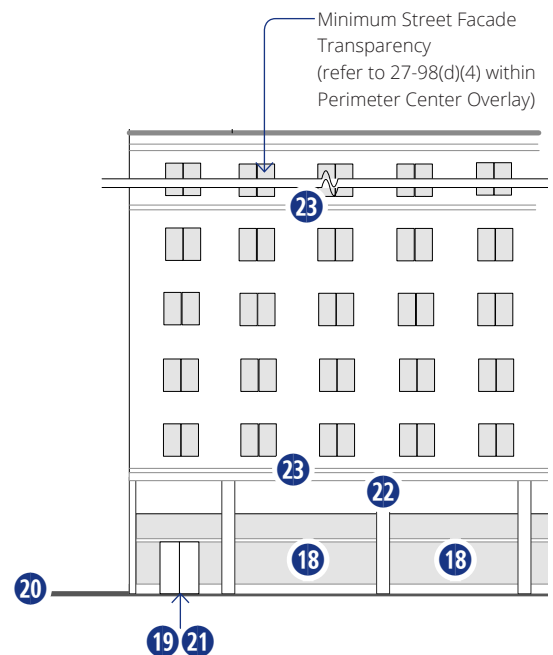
Shopfront Building: Street Facade Design Requirements
